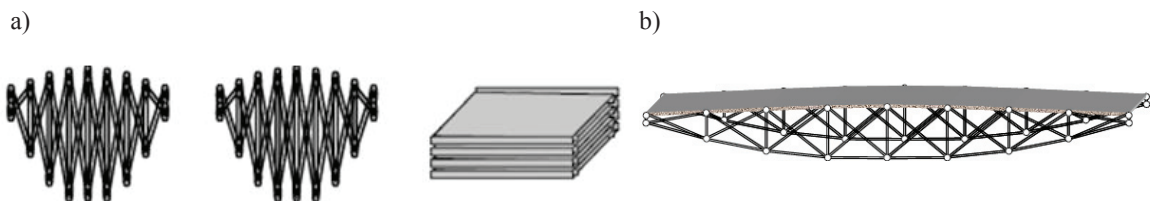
(a) a truss, stay-in-place-form and reinforcement components [22] (b) completed bridge [22].
